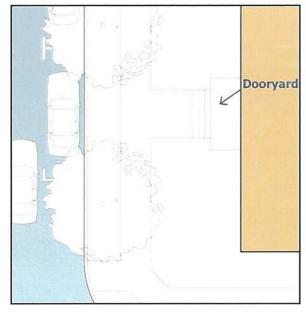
Plan View, Dooryard Frontage (Illustrative; balcony roof not shown)
